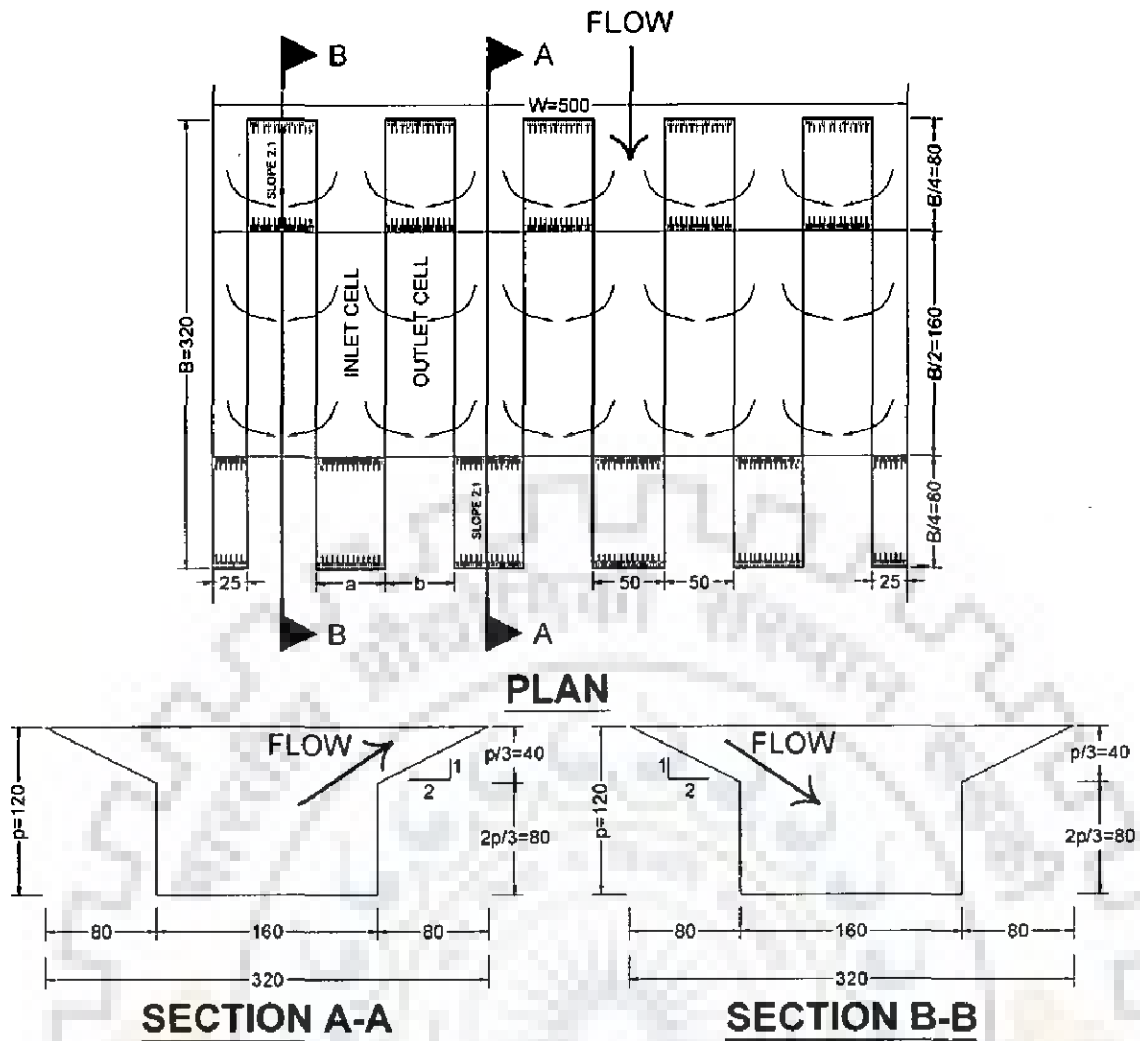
Plan and section of model  $P_1M_1$  (dimensions in mm)
